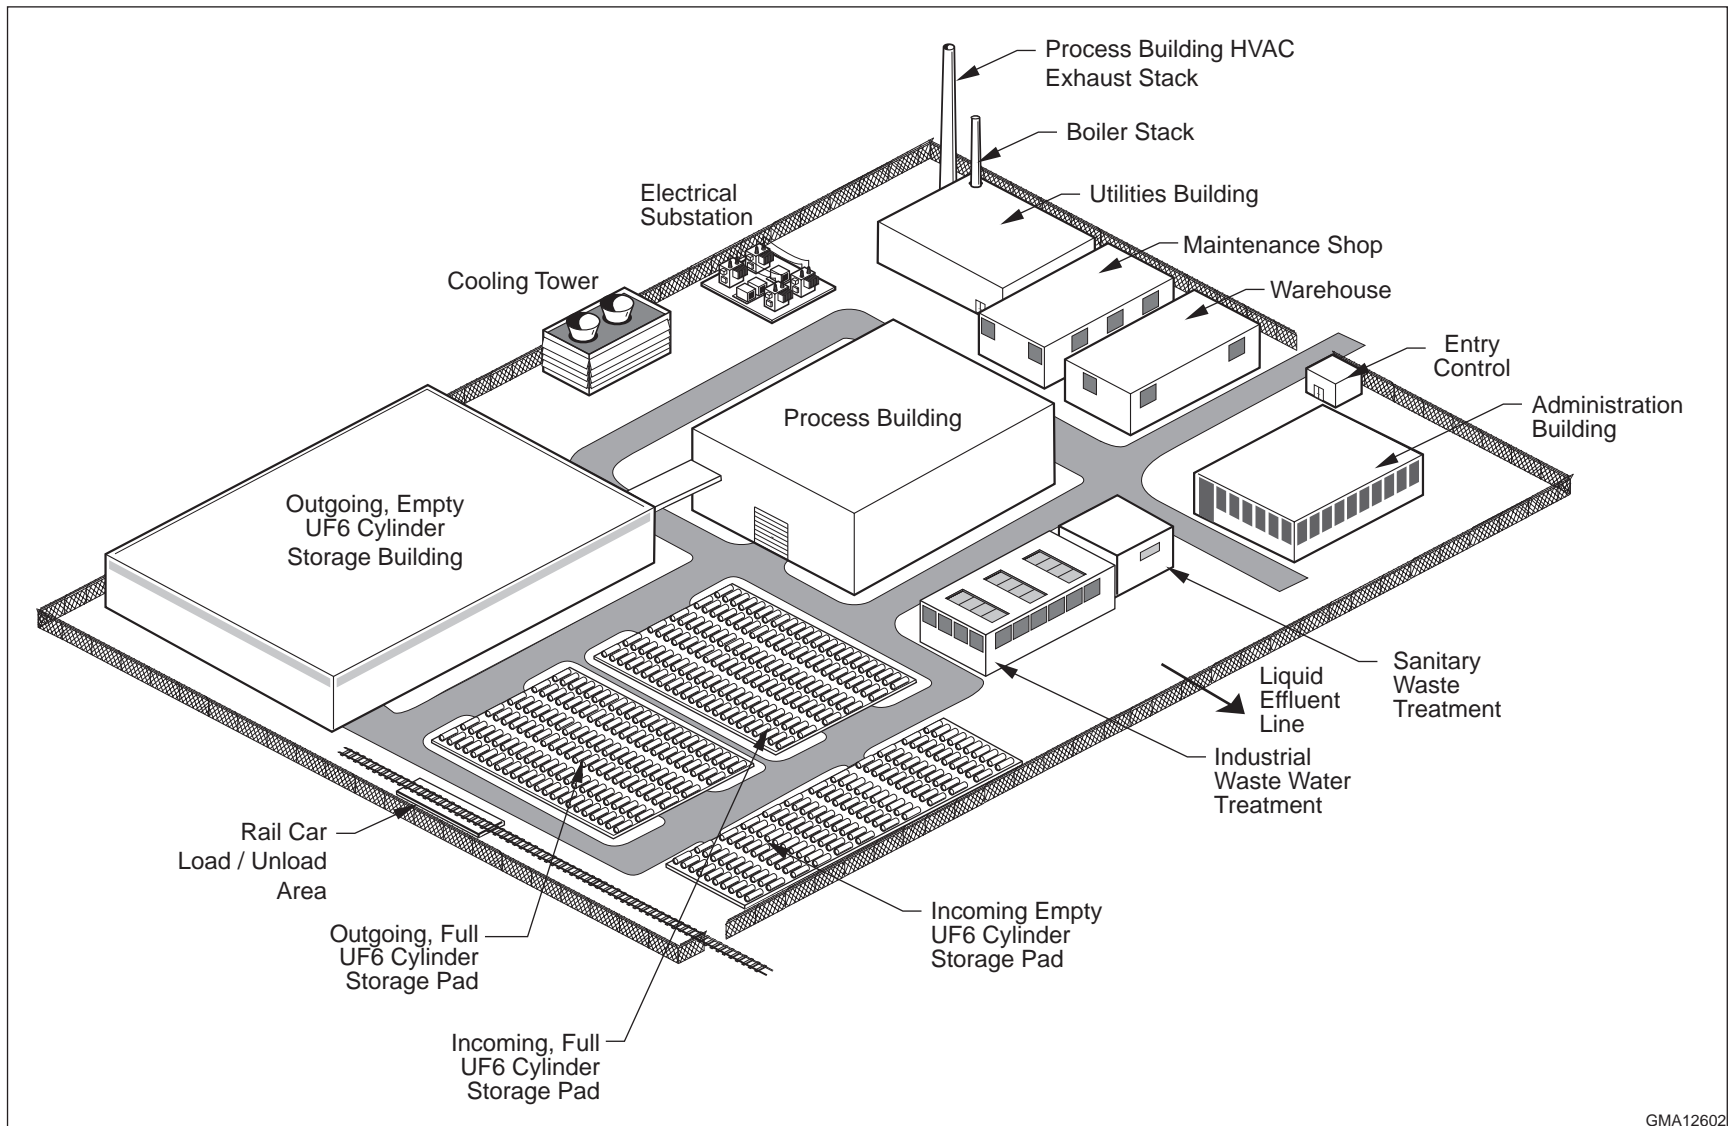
Representative Layout of a Transfer Facility Site (Source: LLNL 1997)
